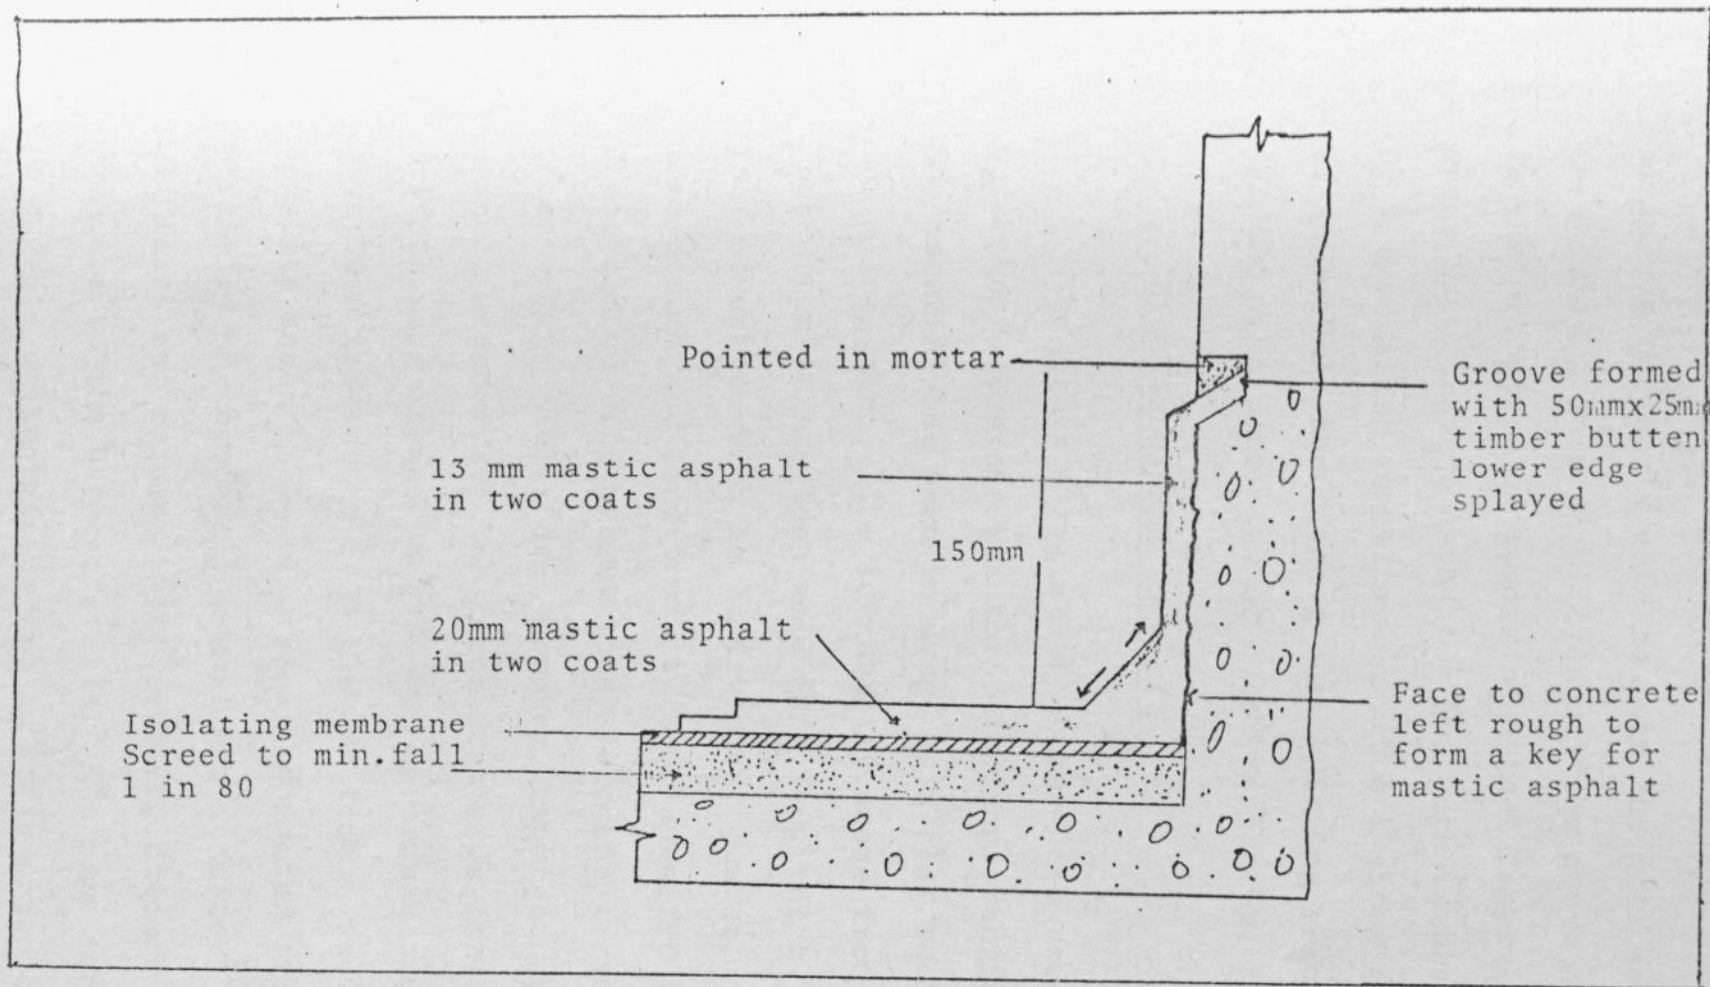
FIGURE I MASTIC ASPHALT LAID ON SCREEDED ROOF AND MASTIC ASPHALT SKIRTING TO CONCRETE WALL
